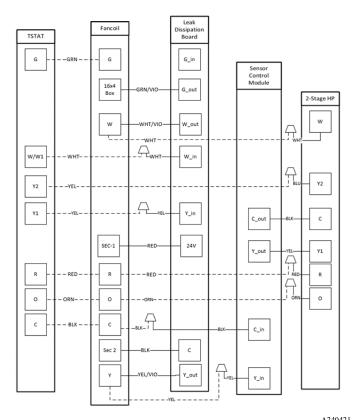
2-Stage Heat Pump Tstat Wiring with Fan Coil Control, Sensor Control Module, and Leak Dissipation Board
